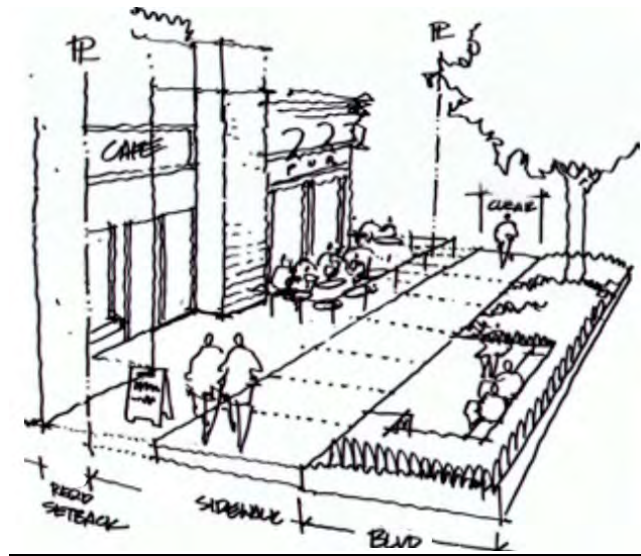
Building frontages set back to accommodate patio spaces in private lands, a clear sidewalk, and a boulevard zone with space for street trees.
